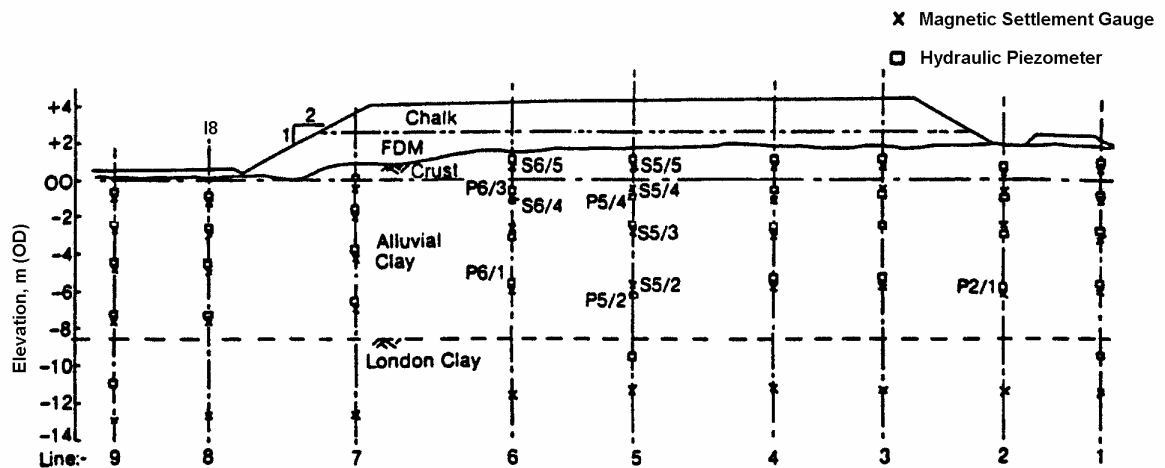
Queensborough test embankment, section of test embankment showing instrumentation (Jardine and Hight 1987).
